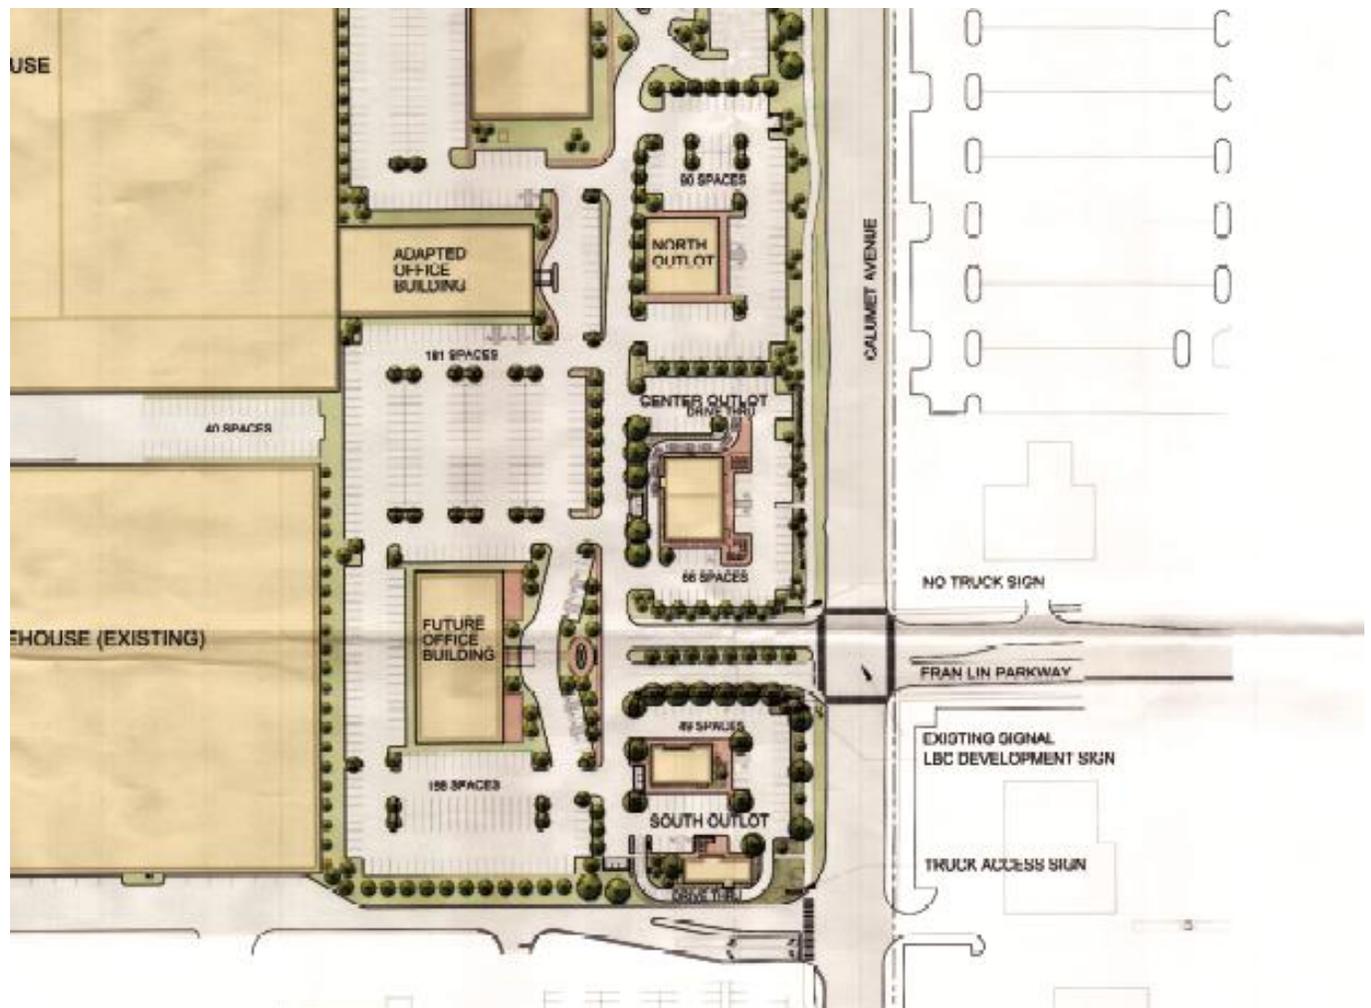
Excerpt from Ord. 1602 showing adapted office building
